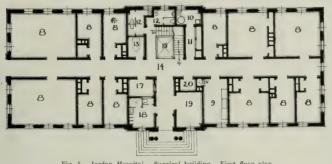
Jordan Hospital. Surgical building. First floor plan.
